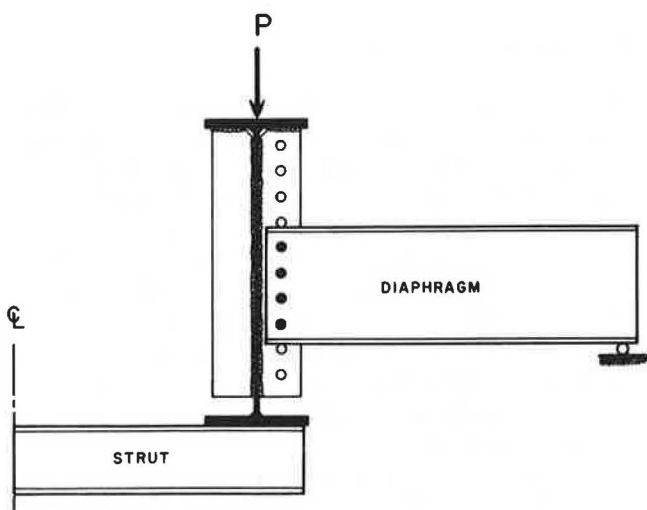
Test setup for distortion-induced web gap fatigue cracking.
